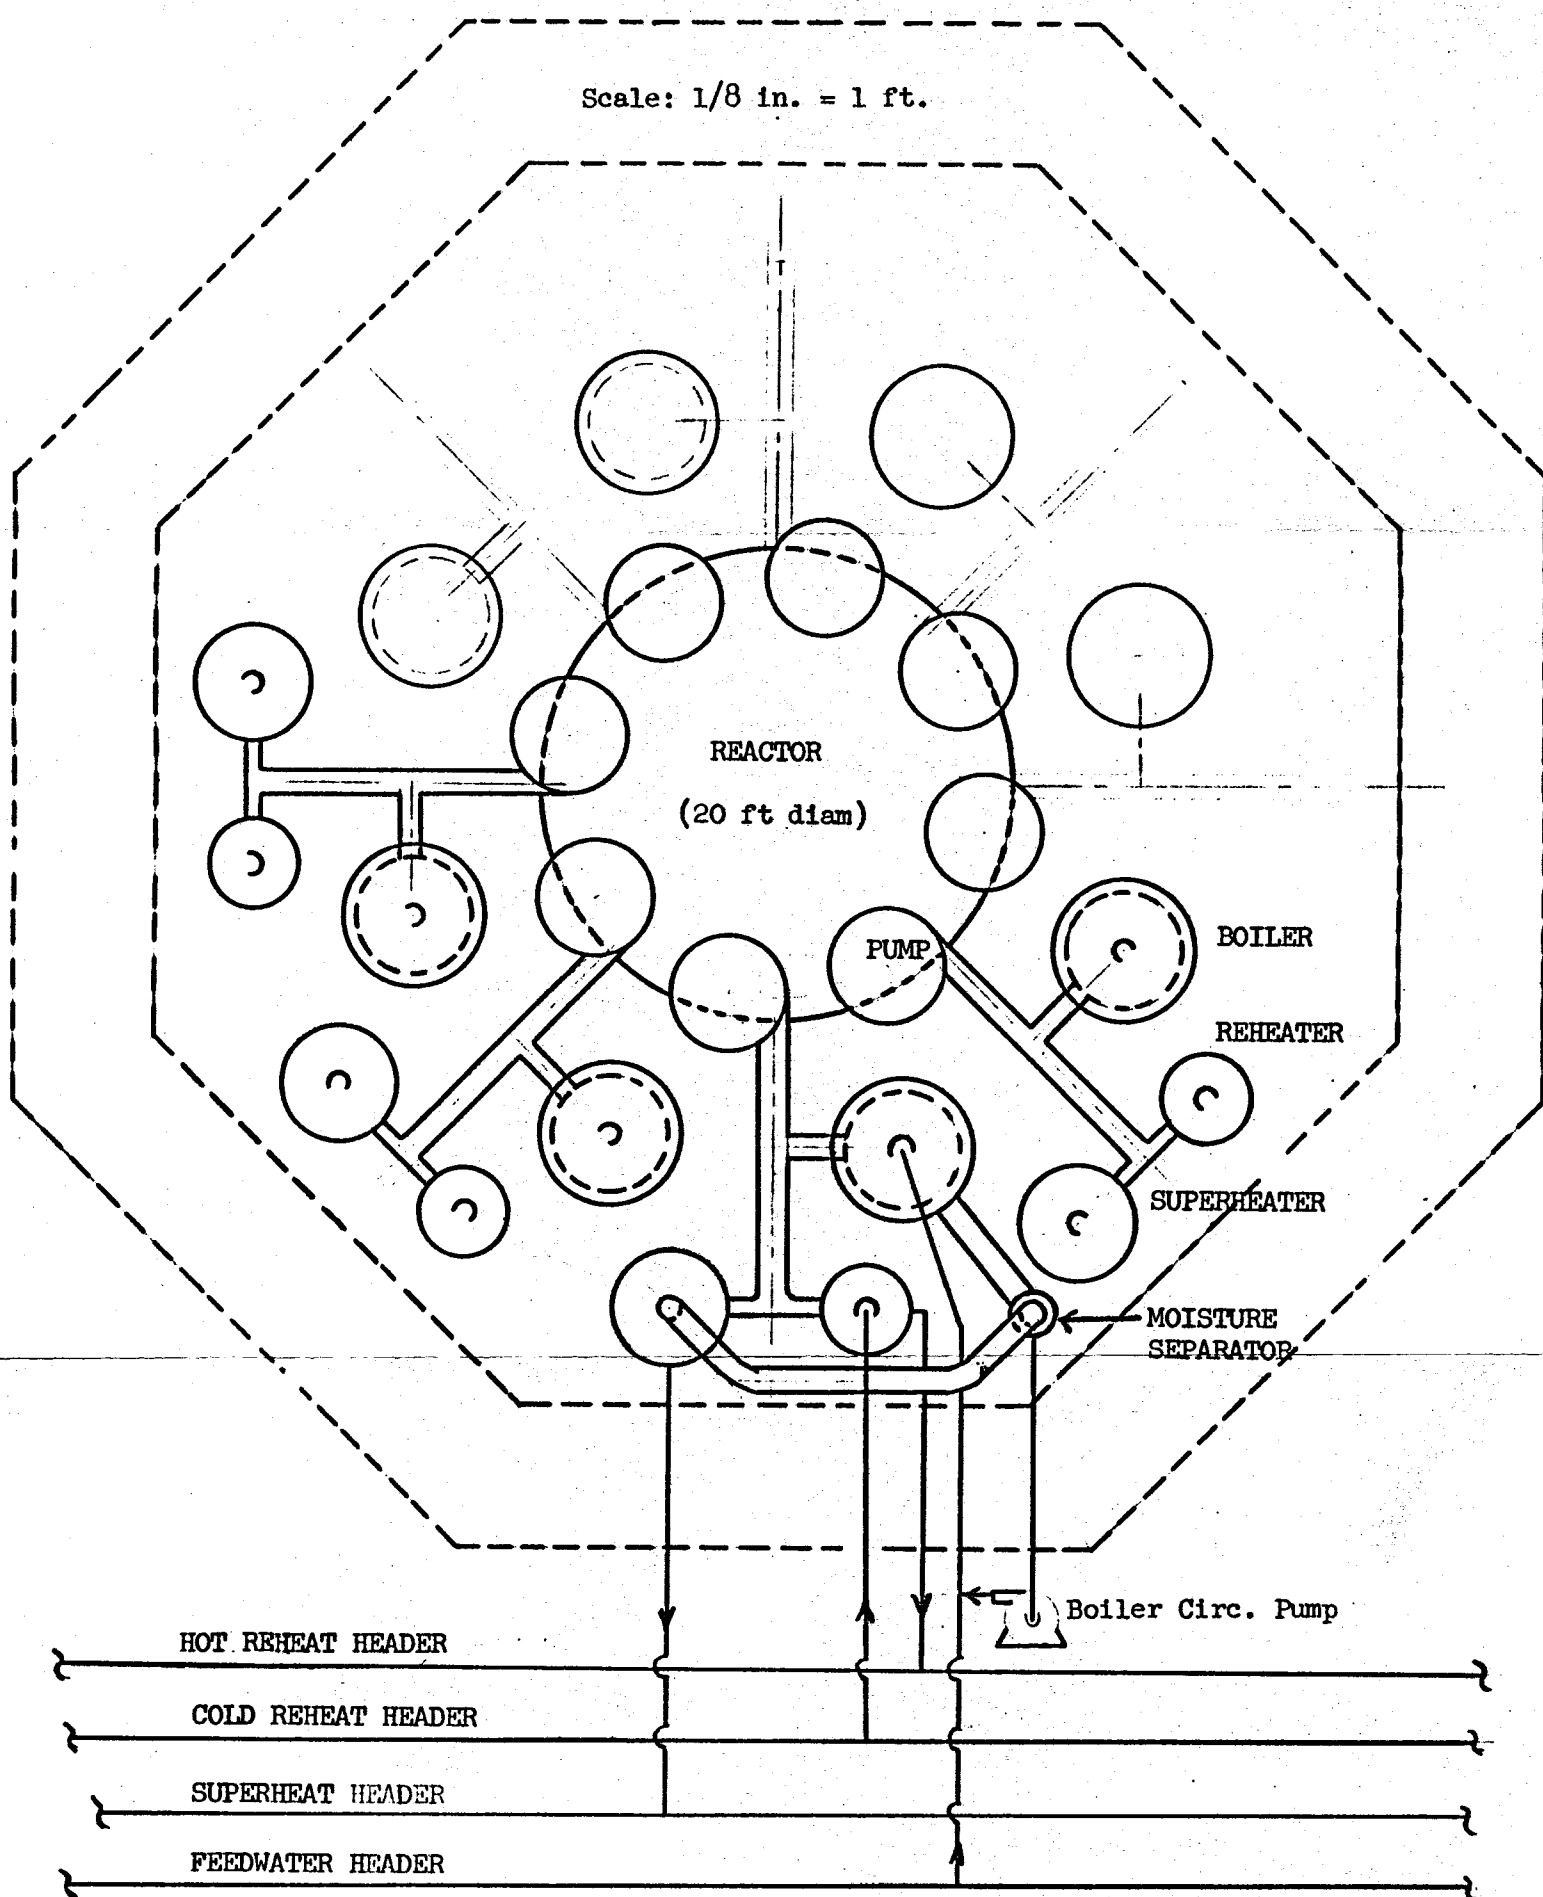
PLAN VIEW SCHEMATIC -- THIMBLE-TUBE HEAT EXCHANGER
